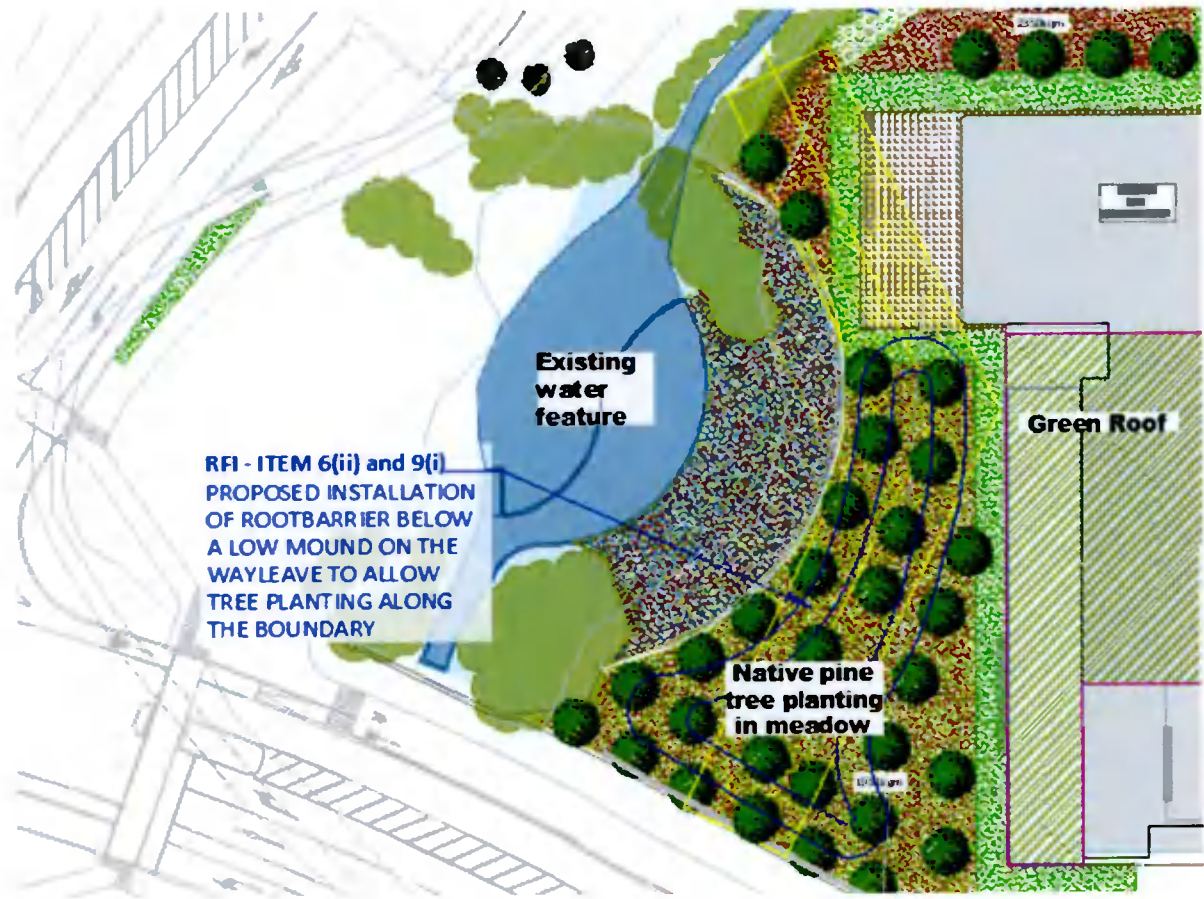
Extract from Site Masterplan west of CAB Building – Tree shown on low mound
